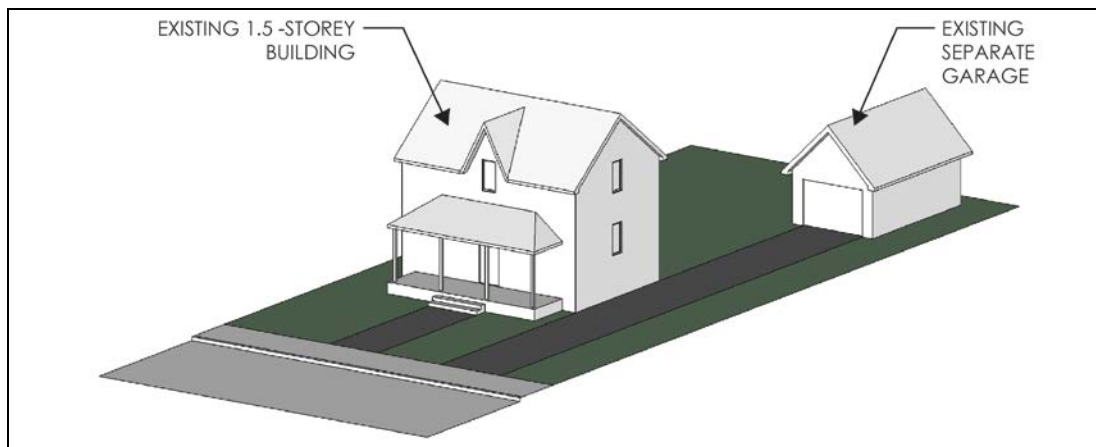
Typical existing massing for a 1.5-storey building on a *contributing* property
